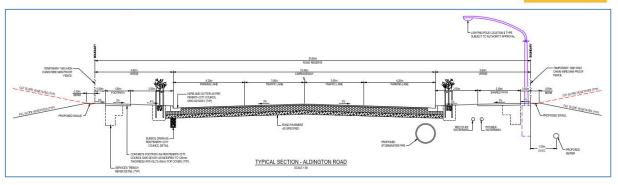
Typical section of the proposed Estate Road (Aldington Road)
